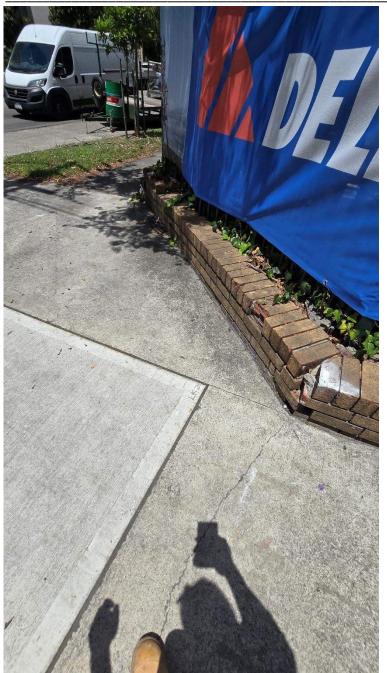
Cracks observed (22, 23) - Retaining wall leaning outwards
